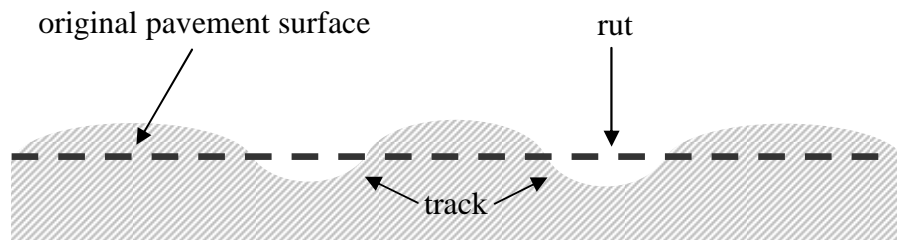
Pavement cross section showing rutting under the wheel path.
